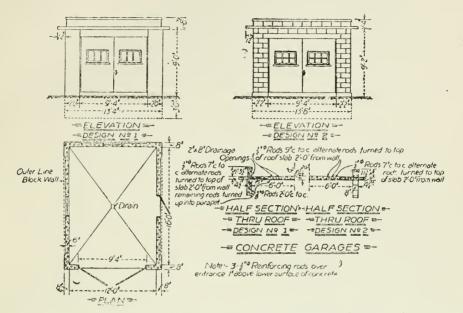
DESIGN FOR A SMALL MONOLITHIC CONCRETE GARAGE SHOWING ALTERNATIVE CONSTRUCTION IF CONCRETE BLOCKS ARE USED.
